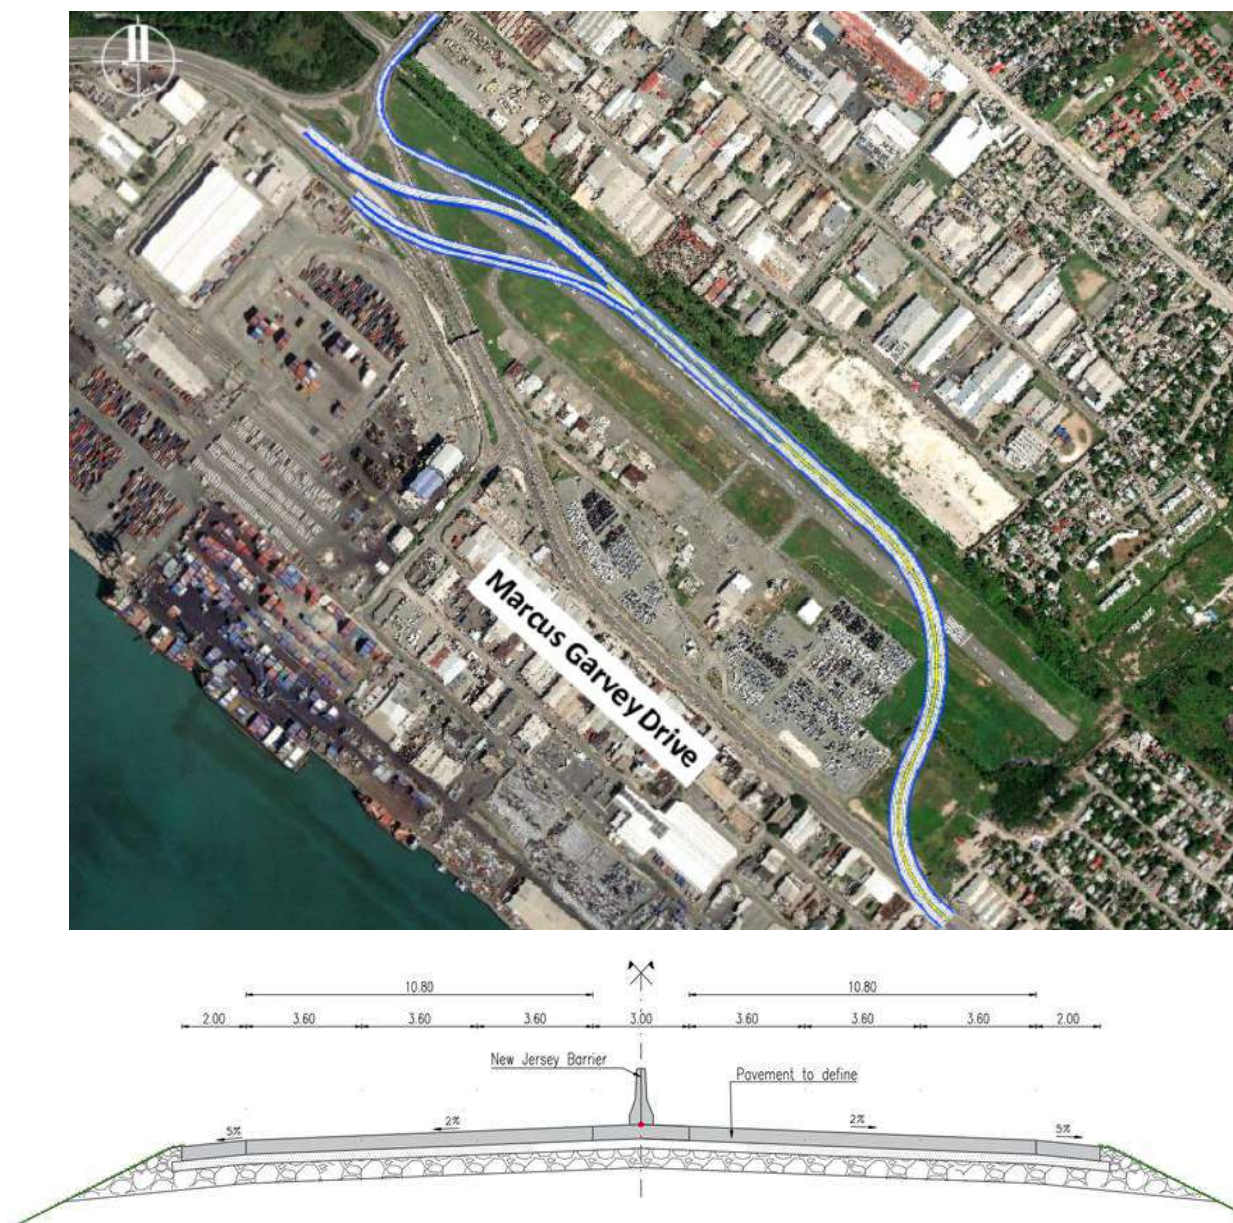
Proposed alignment of the elevated roadway option and cross section of the proposed roadway.
